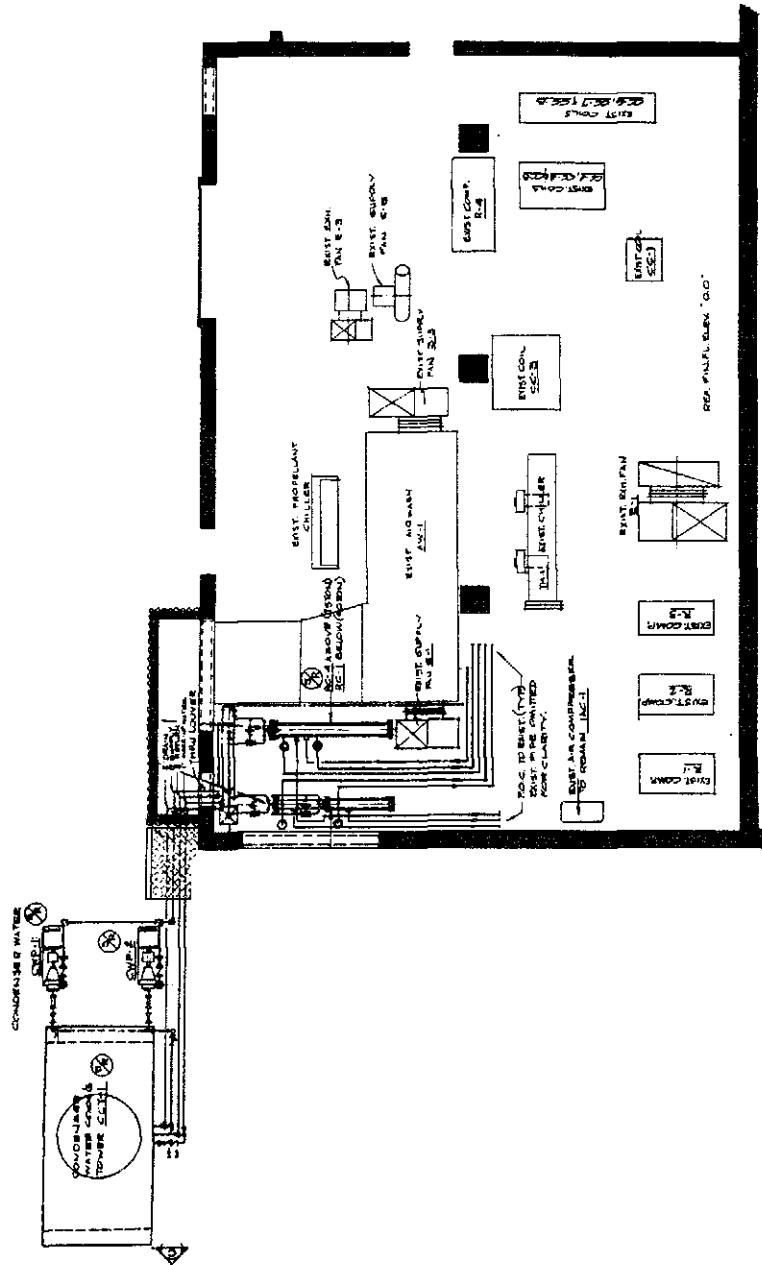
Floor plan of SLC-3E Mechanical Equipment Room, 1975 configuration
